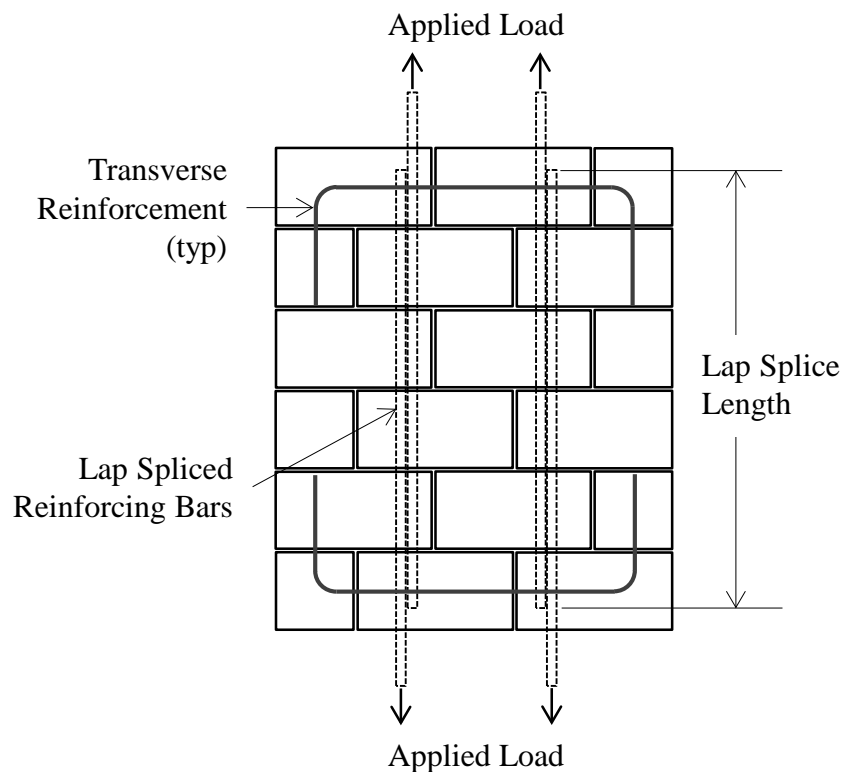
De Vial's test setup and transverse reinforcement design within the lap splice region – Modified from De Vial (2009).
